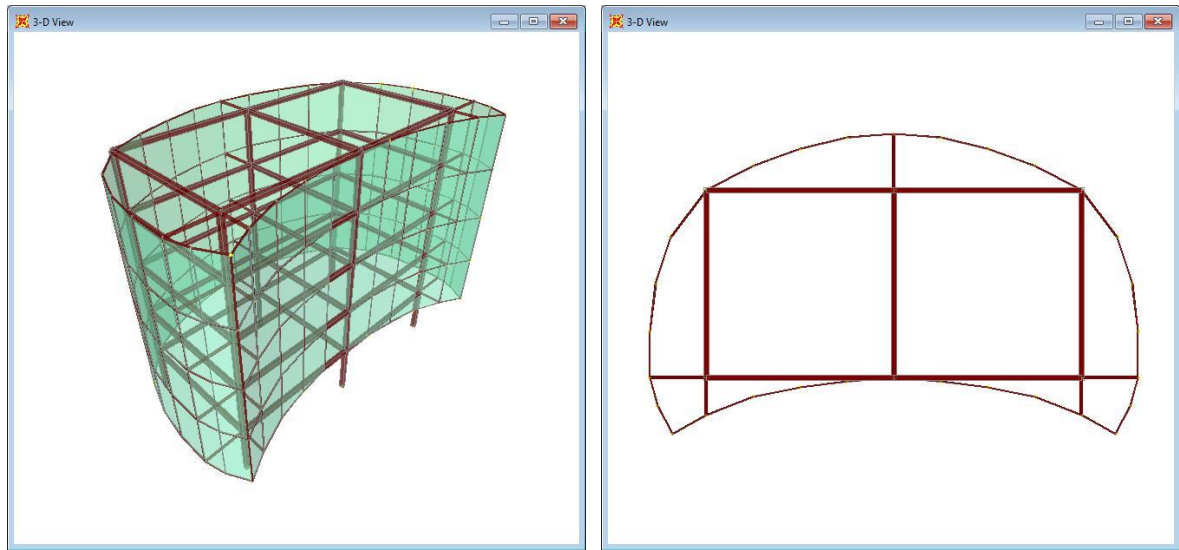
Numerical model of C-shaped (Crescent shape) curtain walled building
